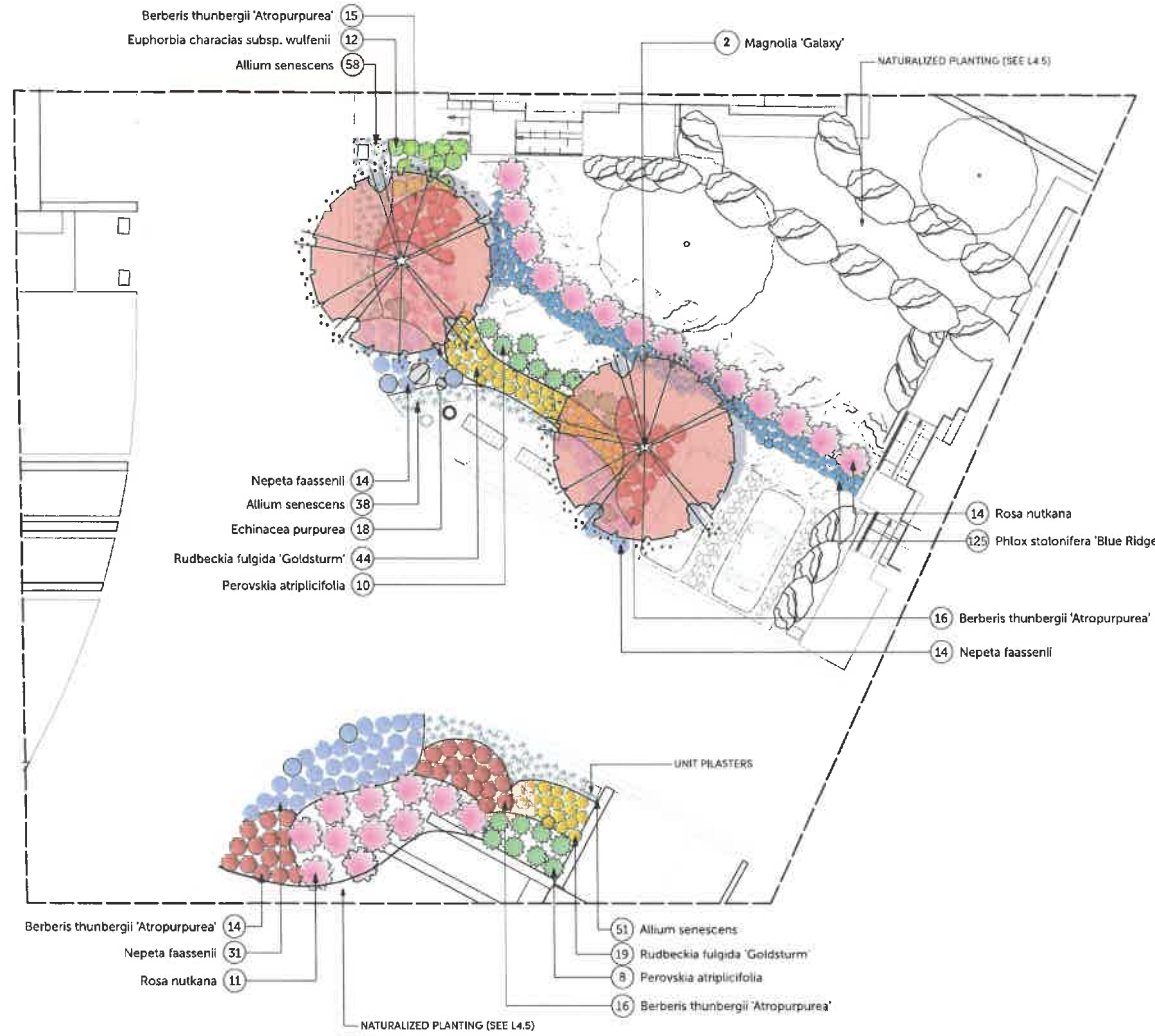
DETAIL PLAN: DAFFODIL DR. ENTRY PLANTING CONCEPT
